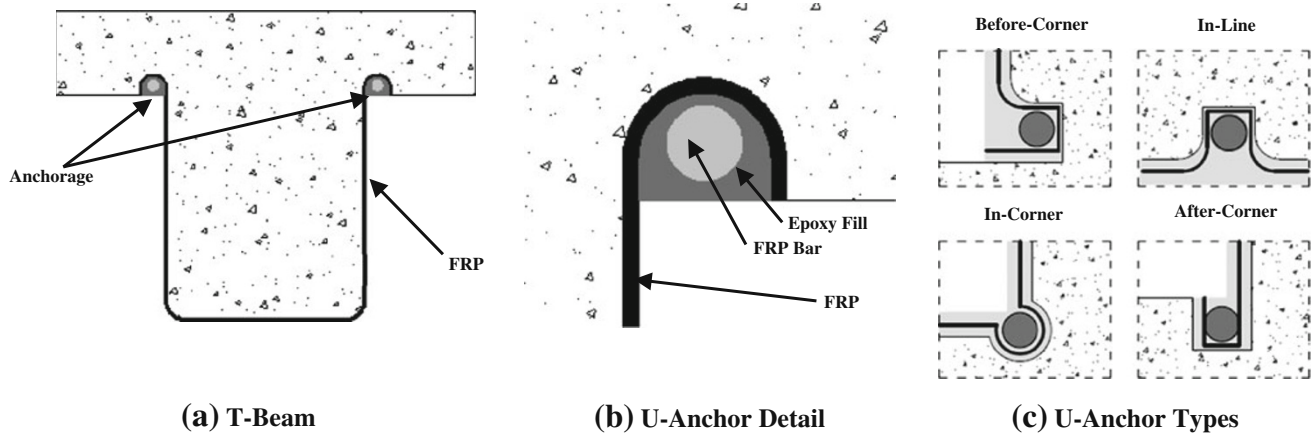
Schematic of typical U-Anchor (Grelle and Sneed 2011).
